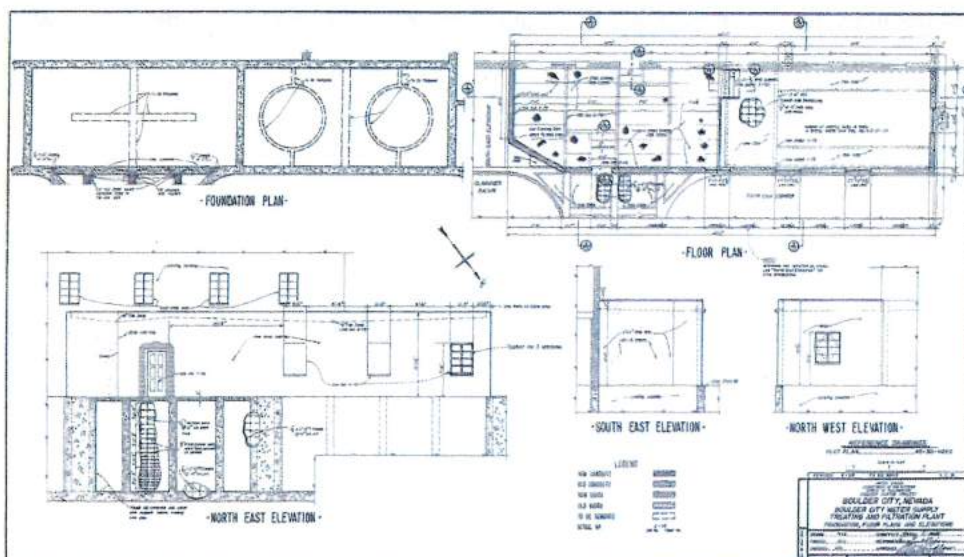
Floor Plans and Elevations from 1950 Drawings for the NE Addition
